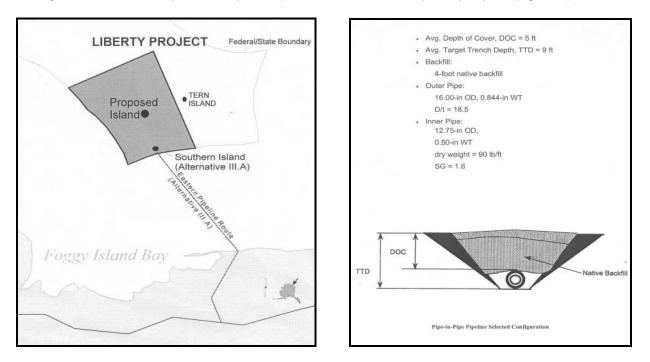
Southern Island/Pipeline Route (Left Side) & Cross Section of Buried Pipe-in-Pipe Pipeline (Right Side).
